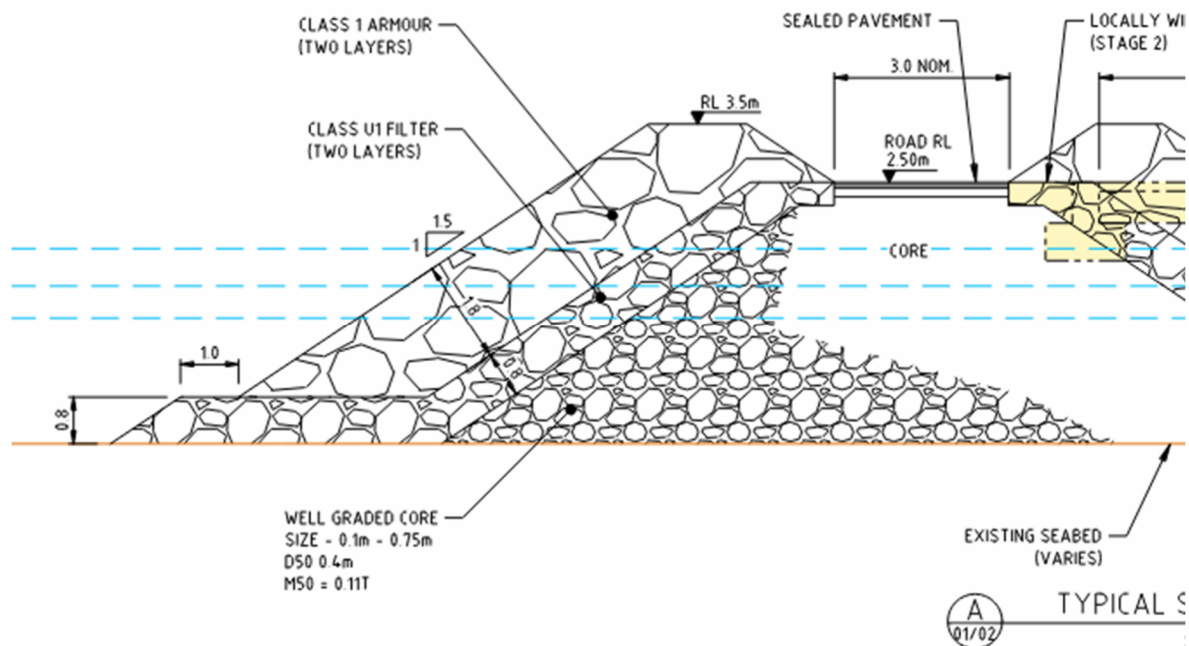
Breakwater Structure Cross Section (from Drawing RIA-2520-19180-MAR-02). The vertical datum is Rottneest Island Datum which is 0.72m below Australian Height Datum.
